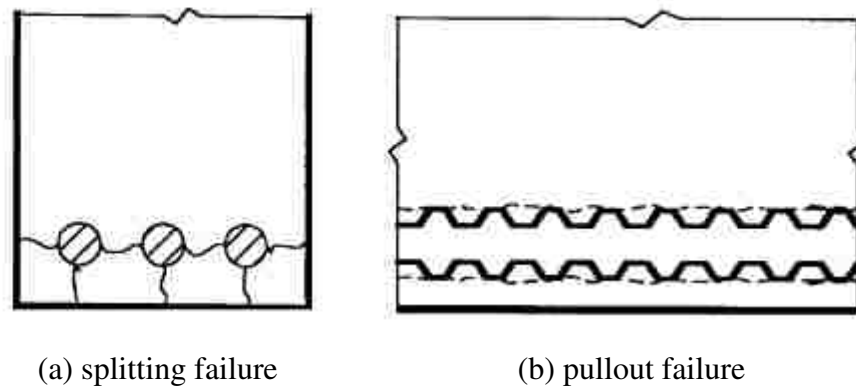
Splitting failure and pullout failure shearing cracks (ACI 408R-03)
